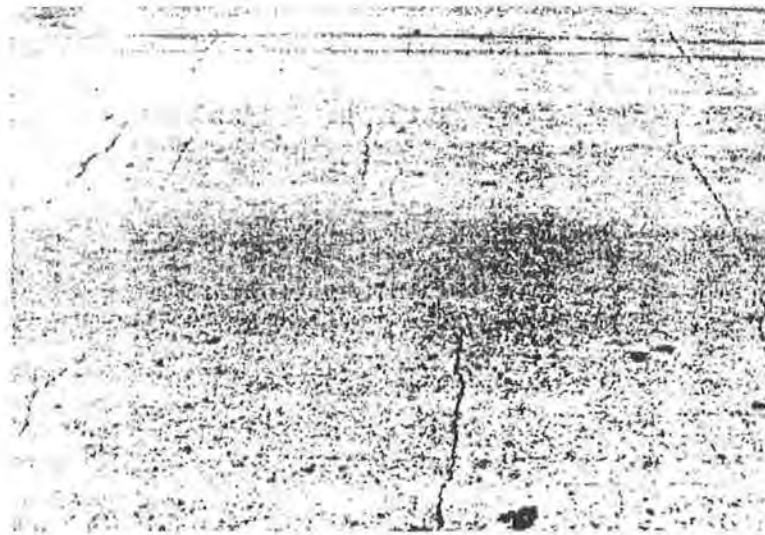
Concrete Deck with Transverse Cracks [16].
